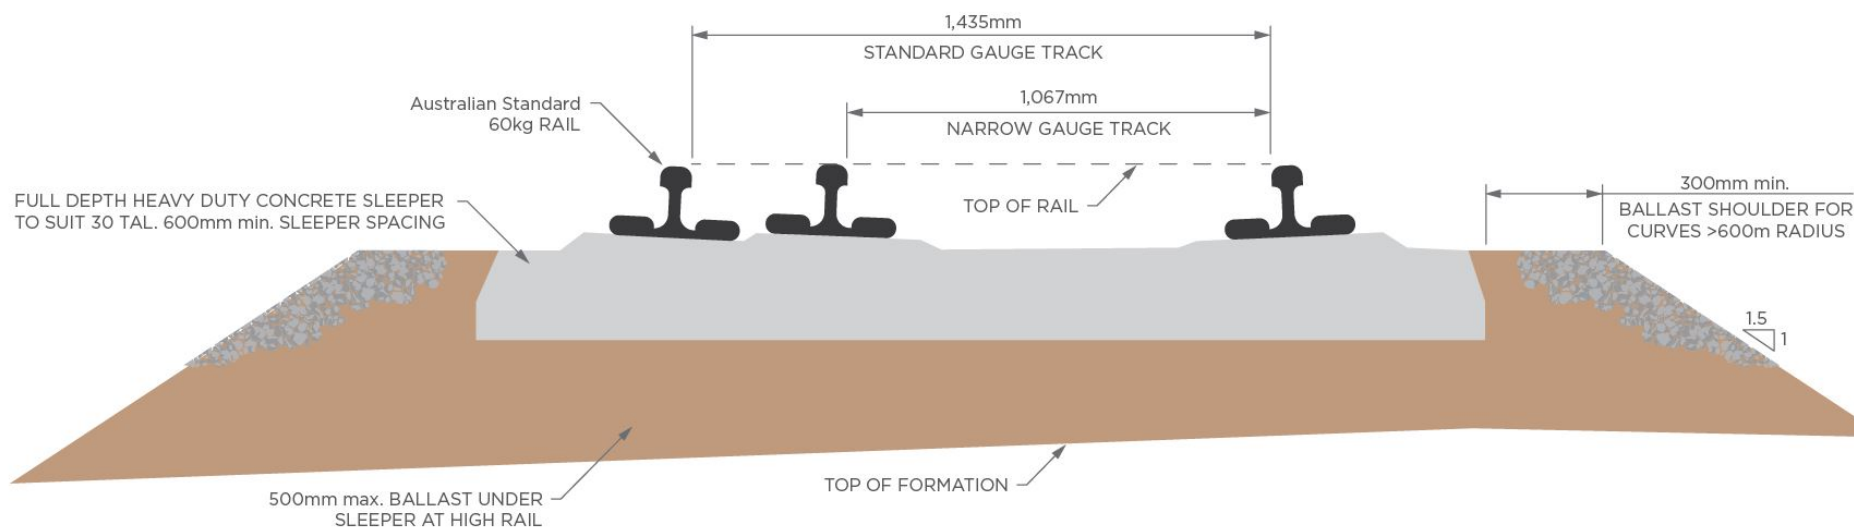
TYPICAL DUAL-GAUGE BALLASTED TRACK CROSS SECTION
